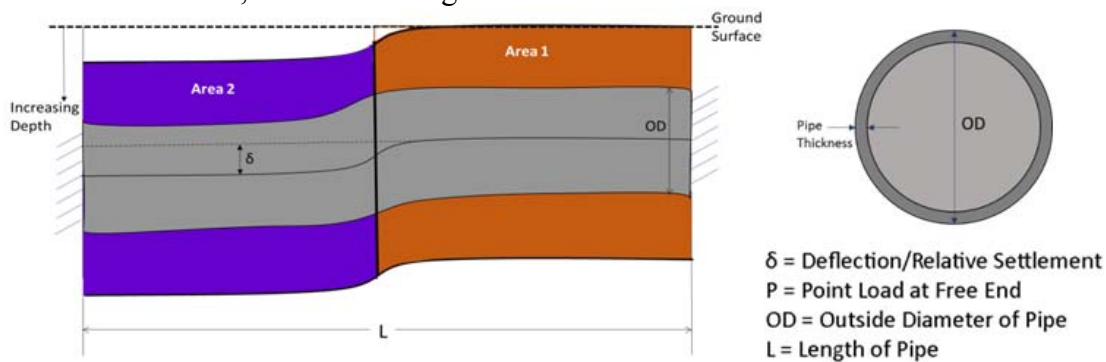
Steel Pipe analyzed with fixed ends and Typical Pipe Cross Section
